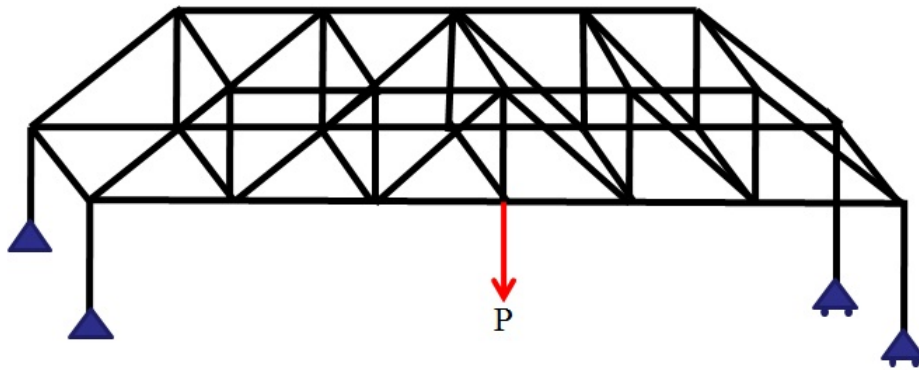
Schematic of intact loaded numerical truss bridge model
